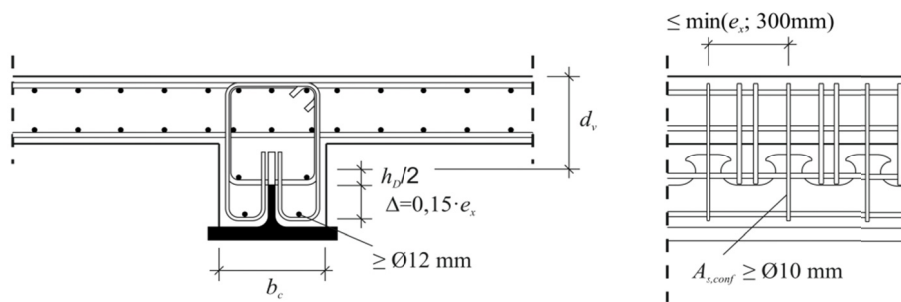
Detailing of reinforcement in composite girder with RC-web and composite dowels.
